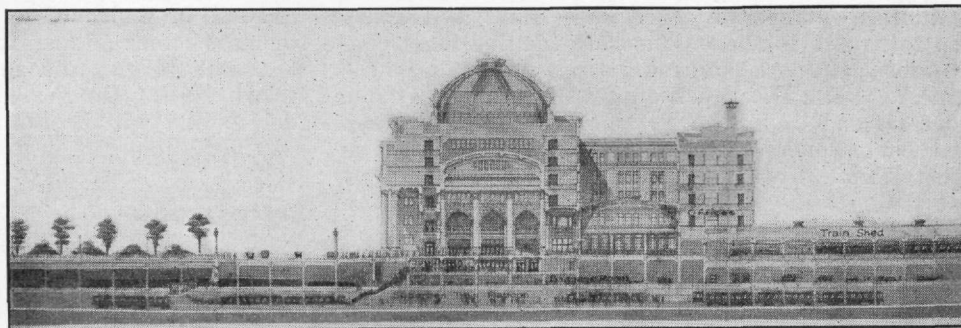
North and south section through station building and train shed, looking east from Indiana Ave. This view shows the three main levels proposed in the new station. The through passenger tracks are located on the same level as Roosevelt Road Viaduct, which makes it possible for patrons to pass through the lobby, concourse and on to the train platforms without using stairs or crossing tracks. The middle level will be used for baggage, mail and express facilities and will be served from Indiana Avenue. The lower track level is occupied by suburban tracks and platforms and can also be used for a future through passenger track level.
